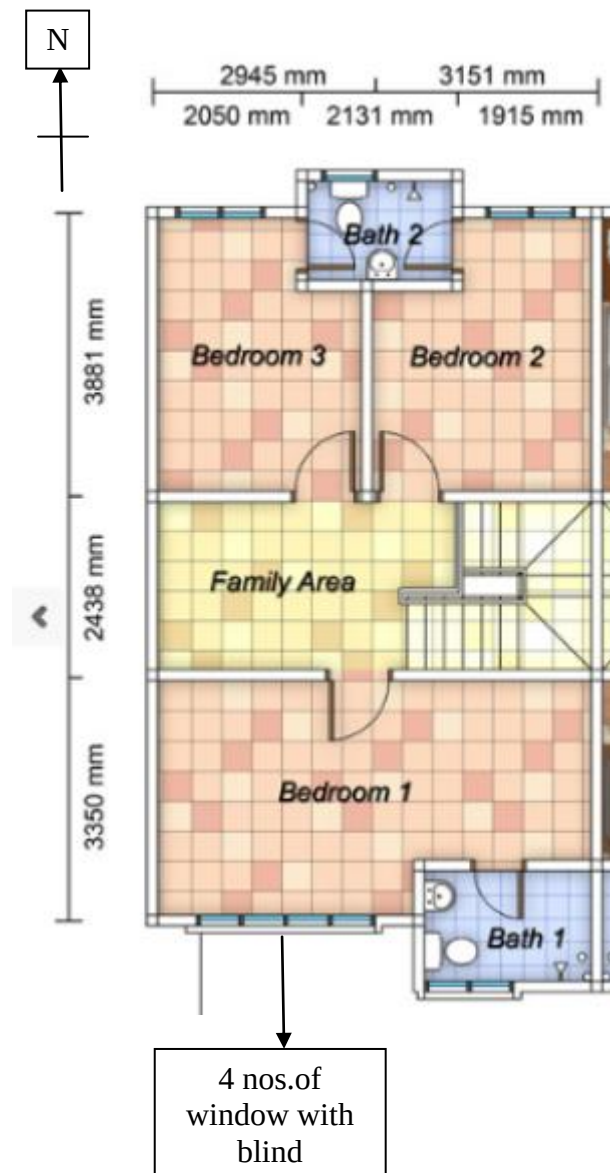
(a): Double Storey Terrace House (Intermediate Unit) – First Floor
